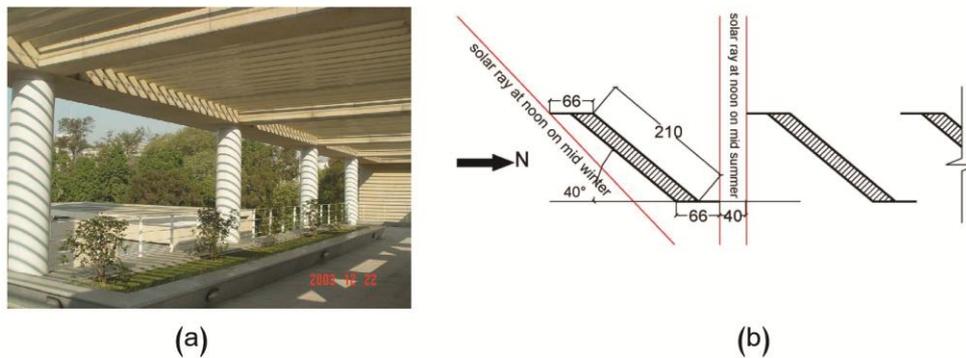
Rooftop shading application, (a) existing photo, (b) dimensions of roof shading device. (Meng and Zhang, 2006).
